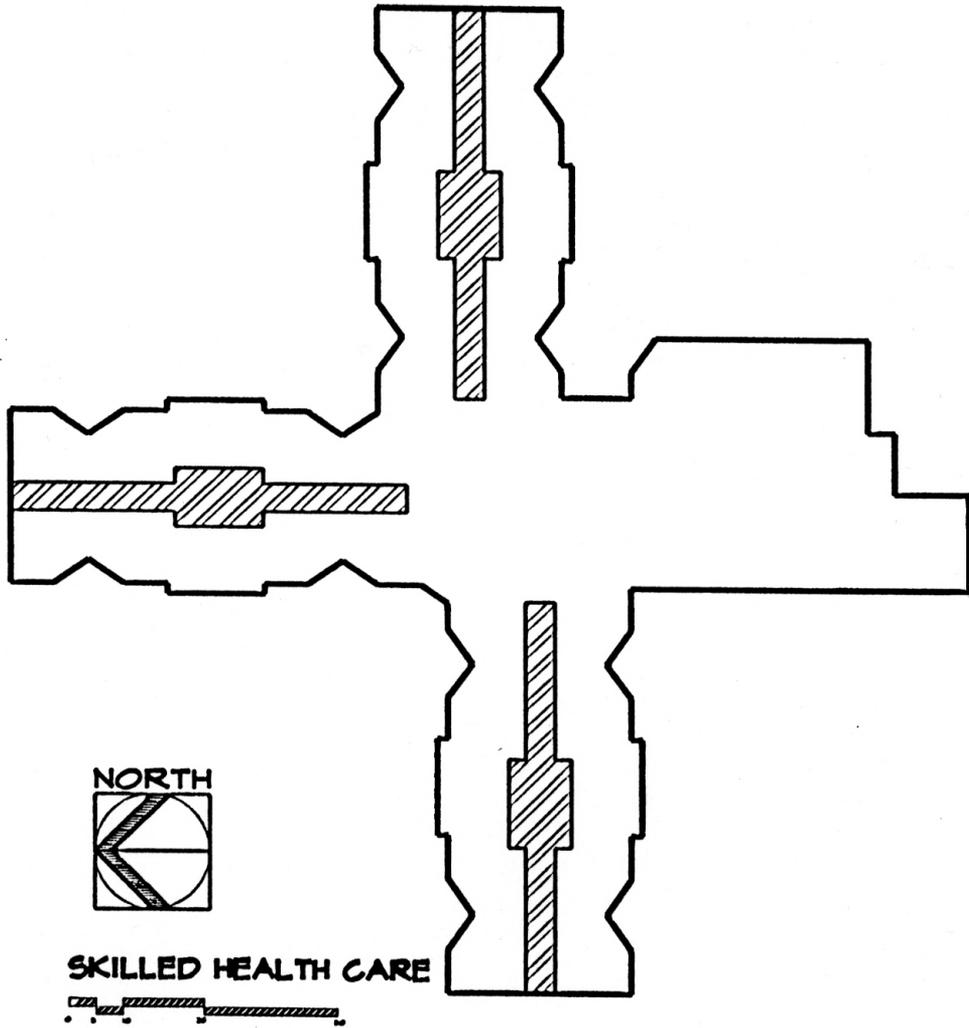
Plan of Skilled Care Hallways - Site 1.
